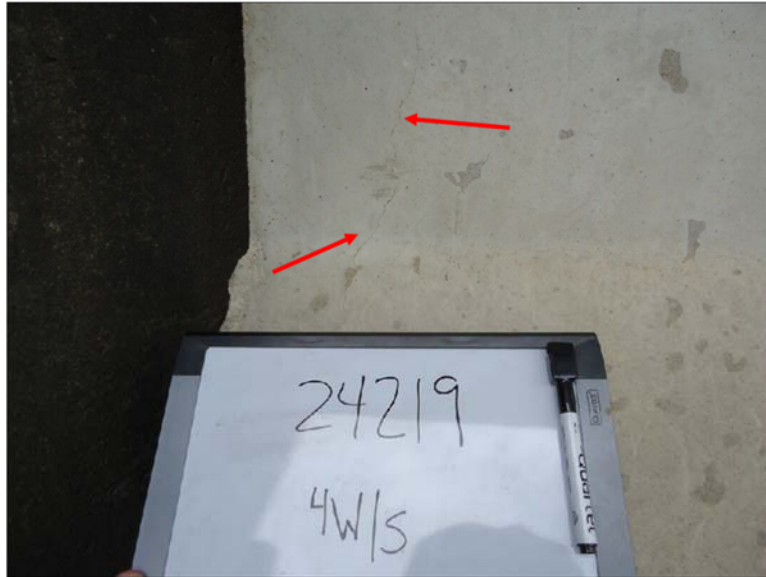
Vertical crack from web through bottom flange (4W-S)
